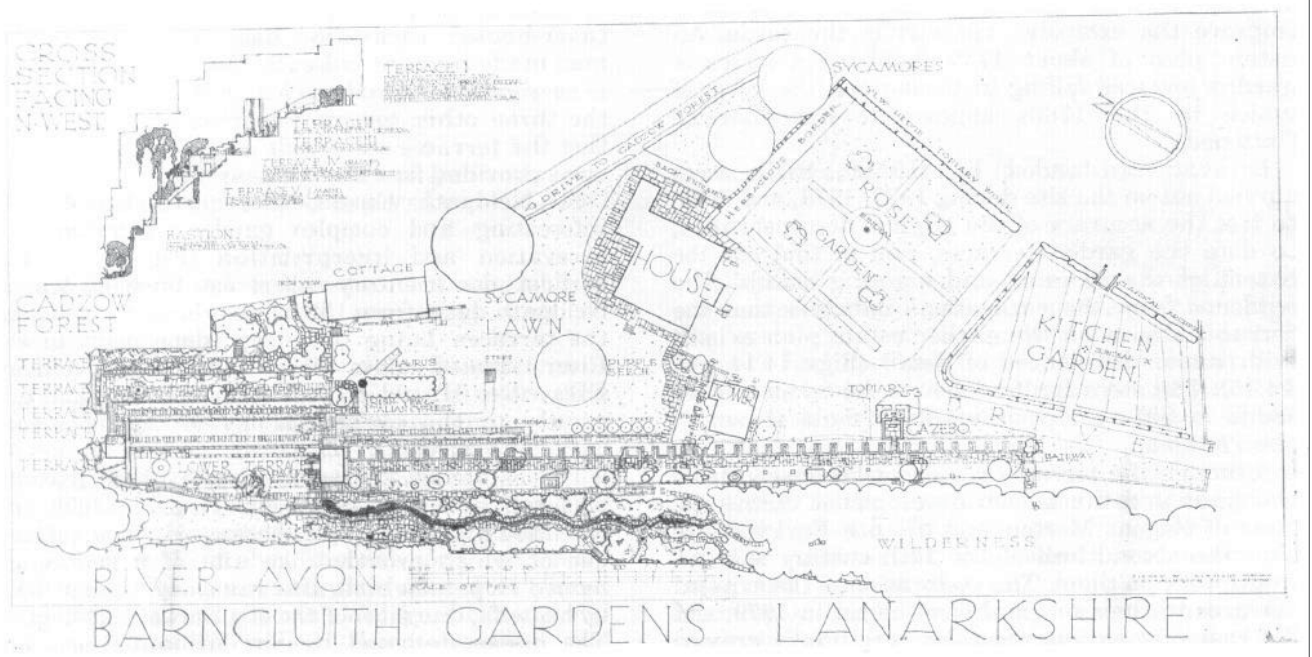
Barncluith, Hamilton District: site plan and details of sections facing NW. Surveyed and drawn by Sidney W Birnage, 1940s (copyright RCAHMS)
